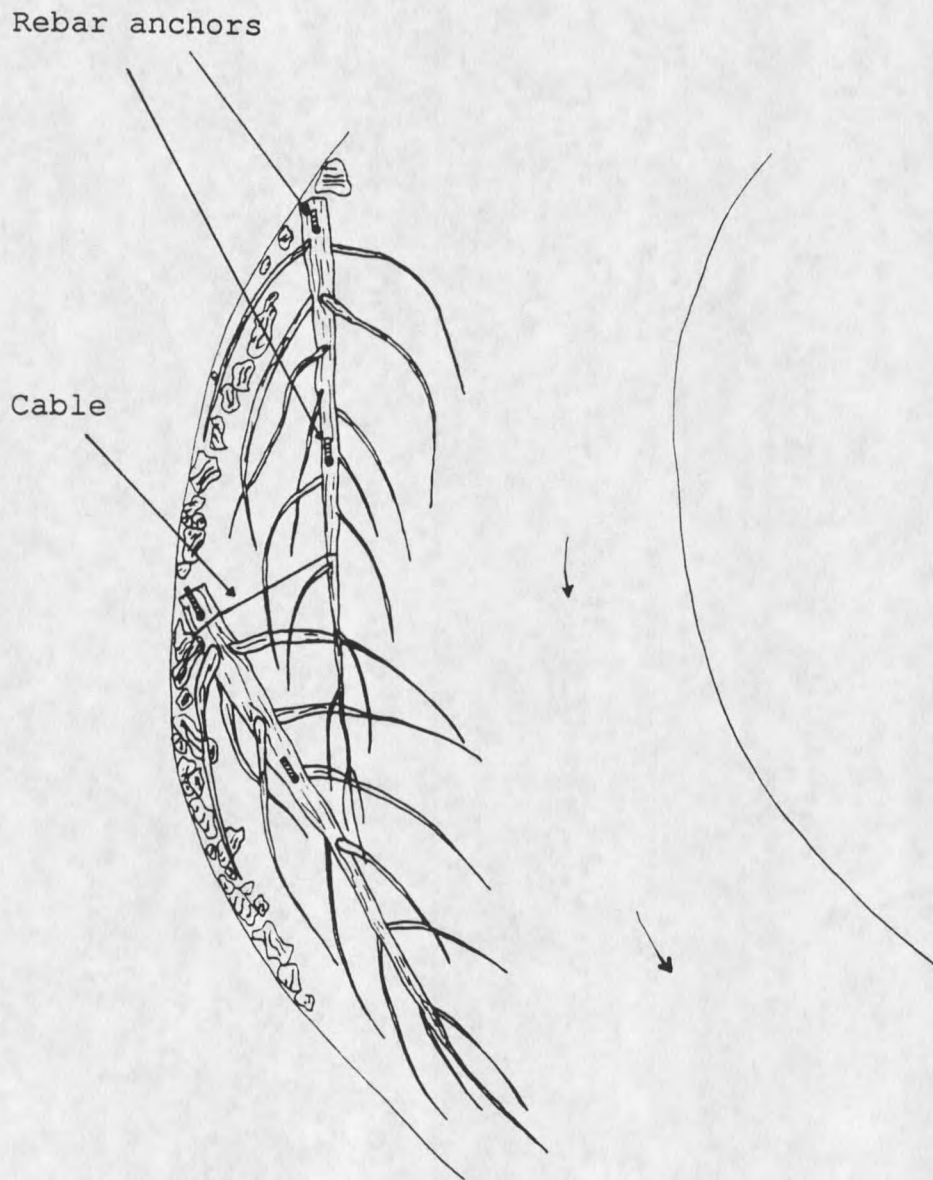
Top view of tree revetment, showing system of rebar anchors, cabling, and rock backfill.
